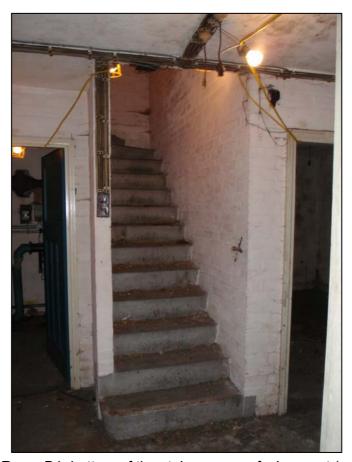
Room B1, bottom of the stairs, camera facing west (ref. HLX 76)
